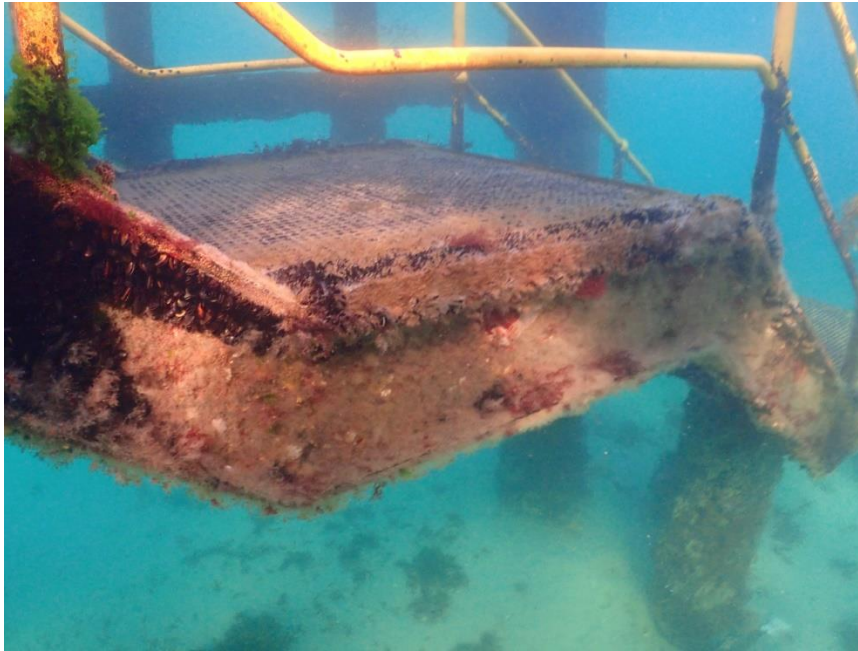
New lower landing HDPE jacketed steel piles: lower section of pile
